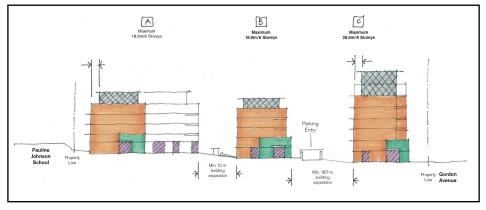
Conceptual Sketch of Street Wall and Building Massing Along 22nd Street
